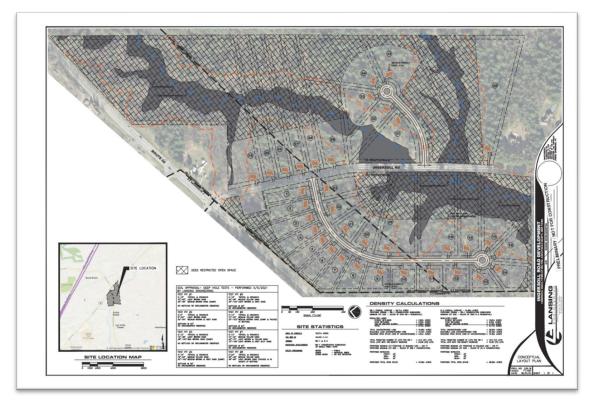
Bordeau Builders conceptual plan for Ingersoll Road – 41-Lot Conservation Subdivision
